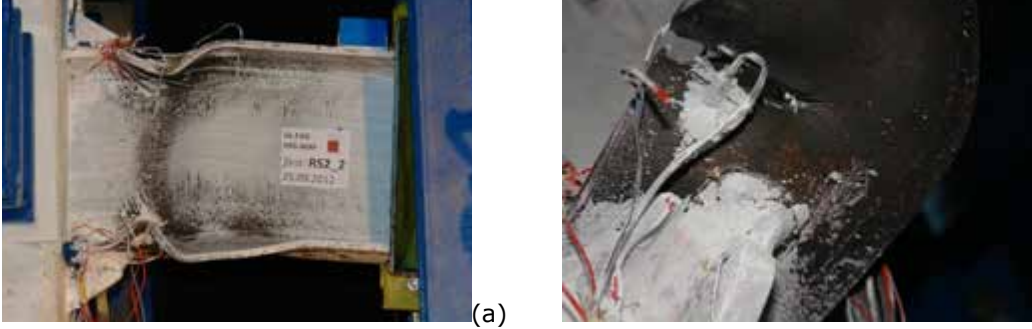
Specimen RS2.2 after the failure: a) overall view: beam local buckling with the spread of plastic zone (darker region), b) detail of fracture in the bottom beam flange
